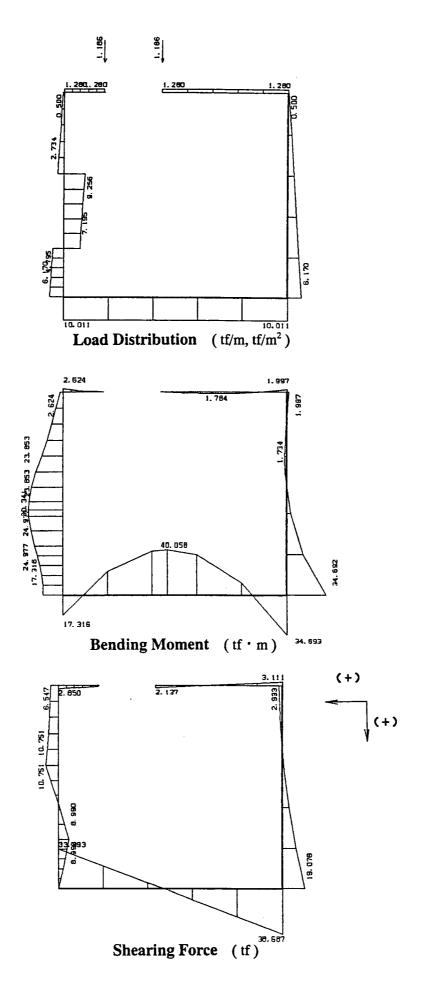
Load and Sectional Force of Case 2 (Downstream; Full)
